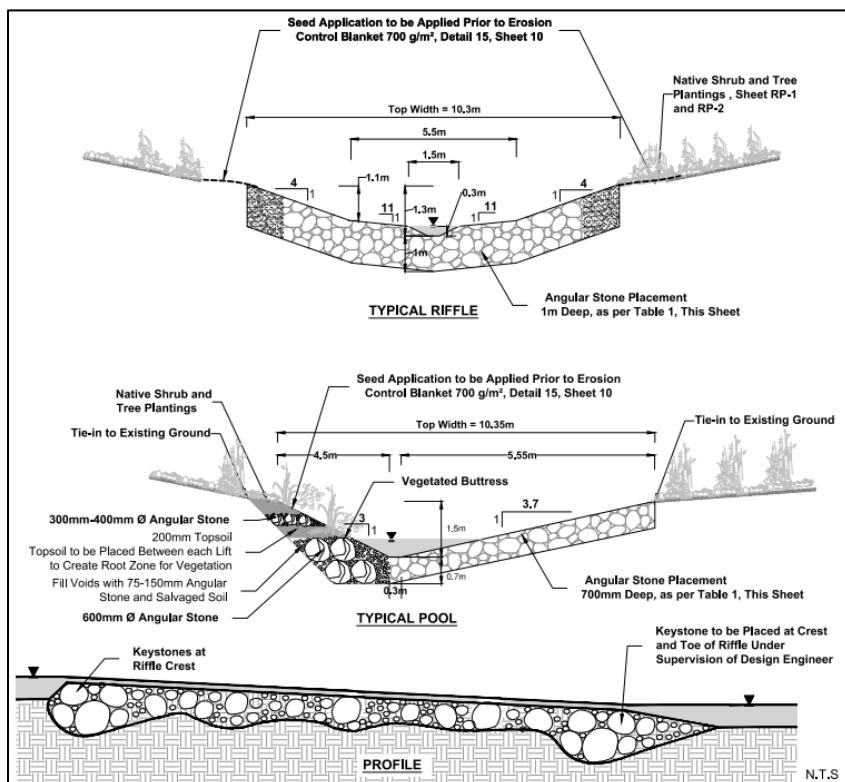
Typical Detail of Proposed Riffles and Pools.
